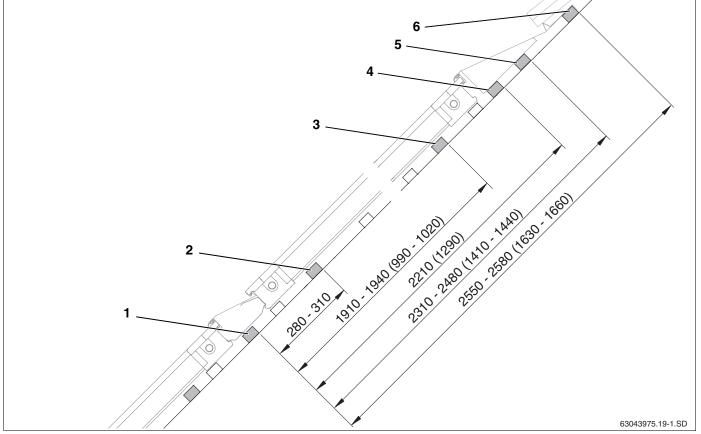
Distances between additional roof battens when installing more than one row (measurements in mm, values in brackets = landscape version)
